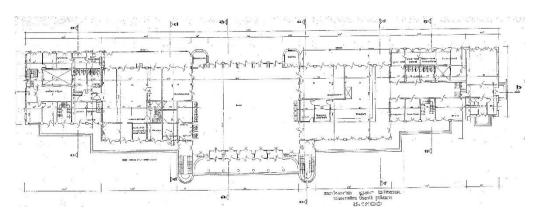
Ankara station project / Ground floor plan. Copy drawings by TCDD staff technicians. Date 1993.
